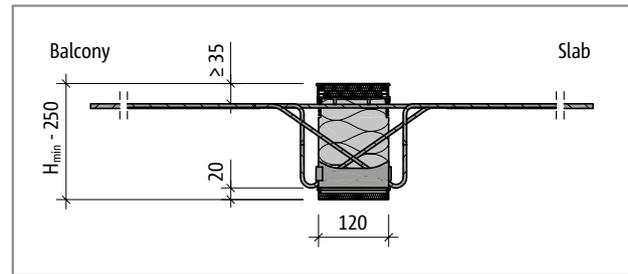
Schöck Isokorb® XT type K-M5-VV1: Product section
